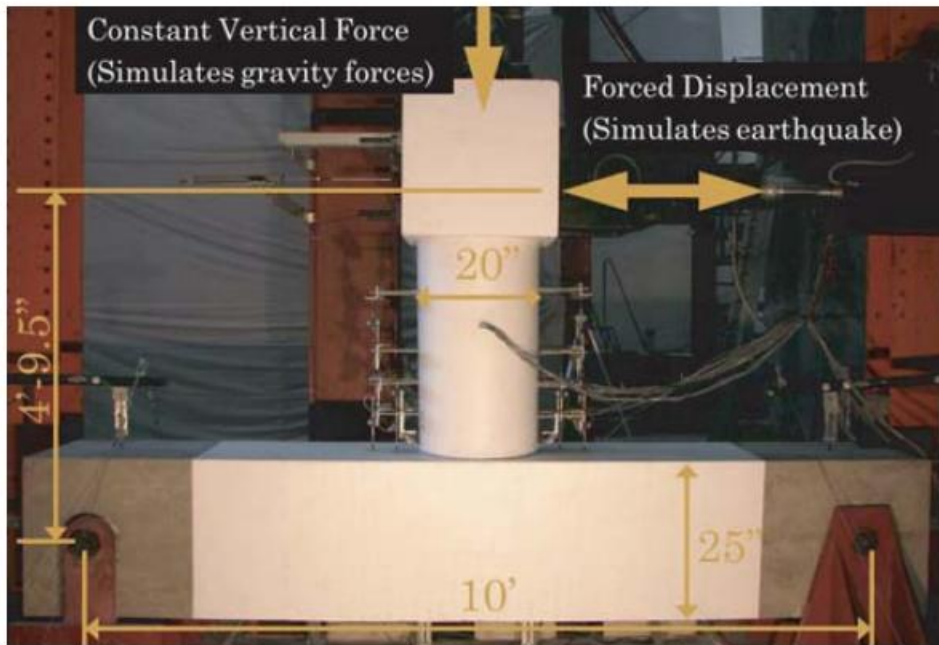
Test setup of specimens tested by Tobolski (Restrepo 2011)
